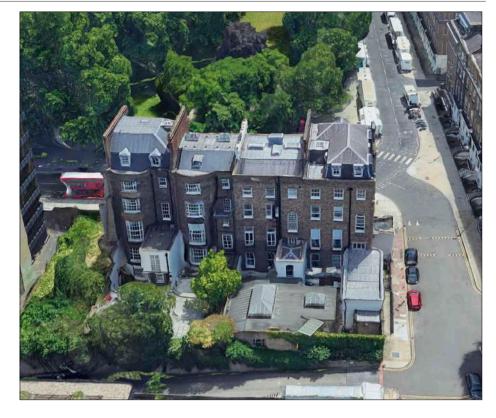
3D Imagery of Faber Building, Rear Elevations
